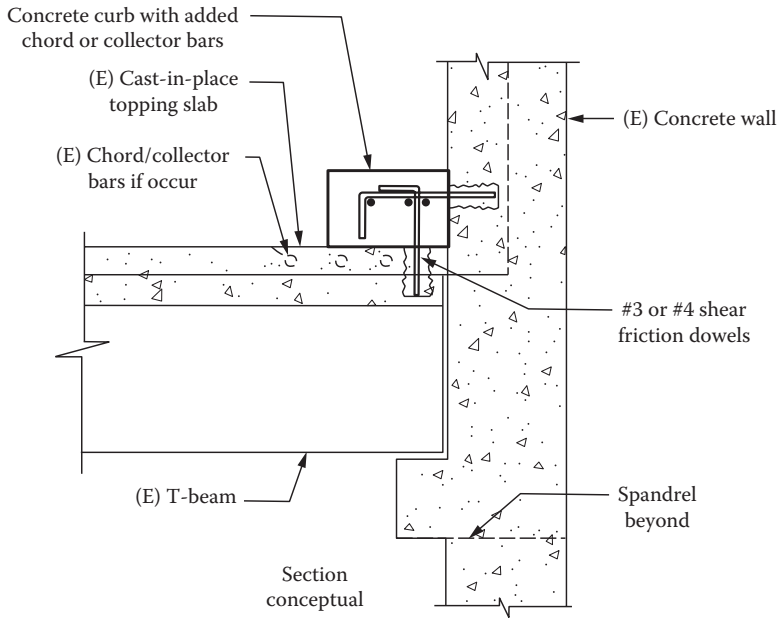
Added collector anchorage at shear wall with cast-in-place topping slab.
